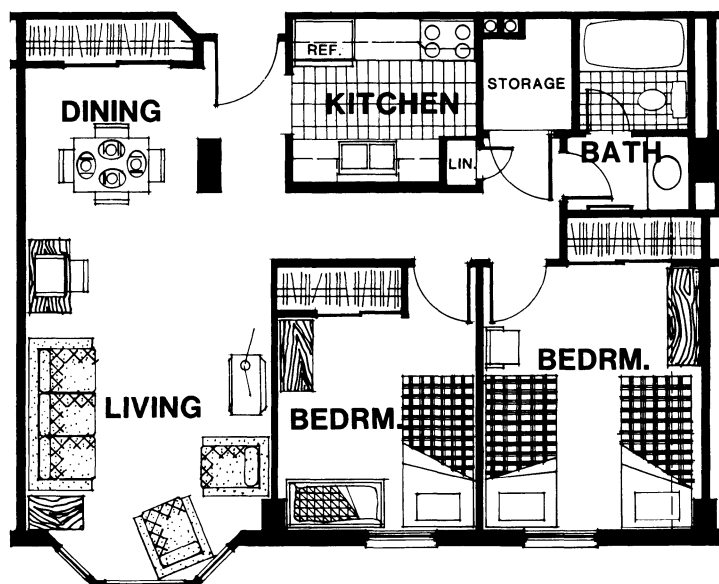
Typical two-bedroom apartment plan of Decatur Place, Denver, Colorado (Courtesy of Warren Village staff).
